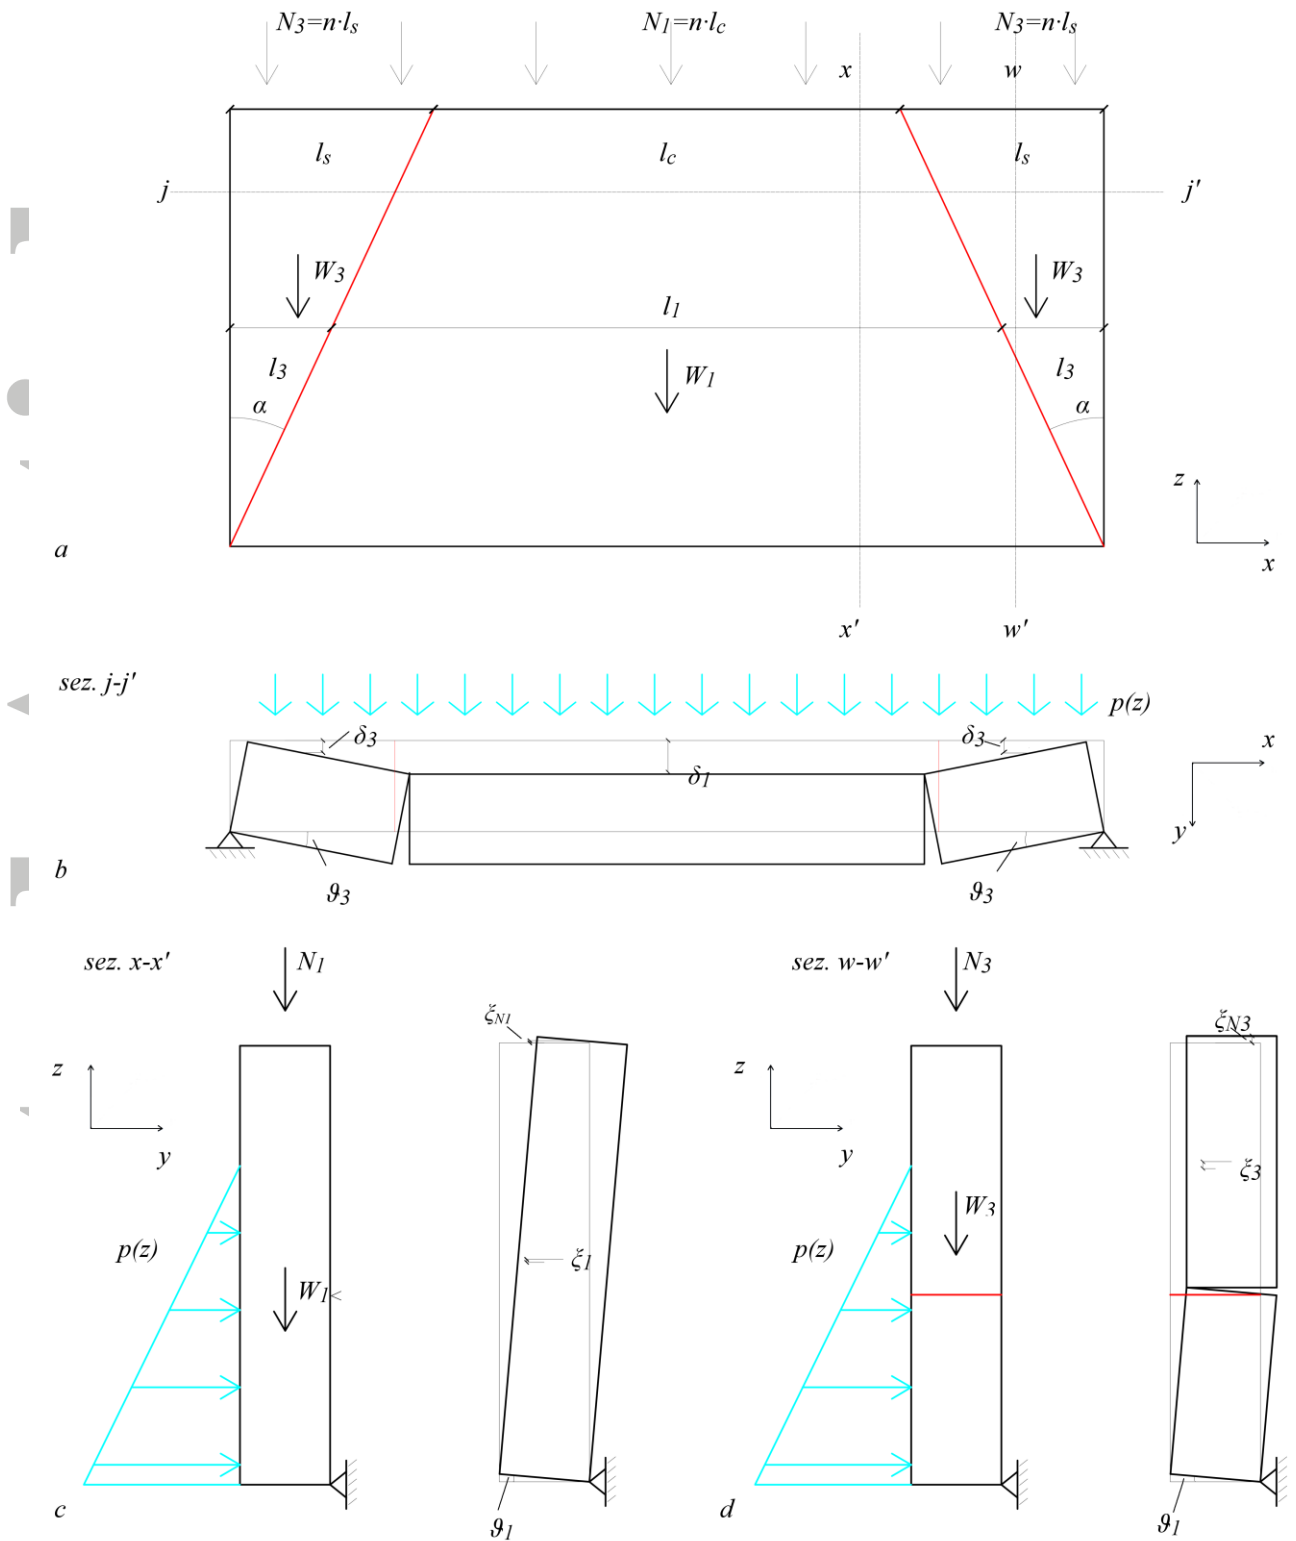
Reference wall P3 (3-edges support) collapse mechanism. Front view (a), plan cross section (b) and vertical cross sections (c, d).
